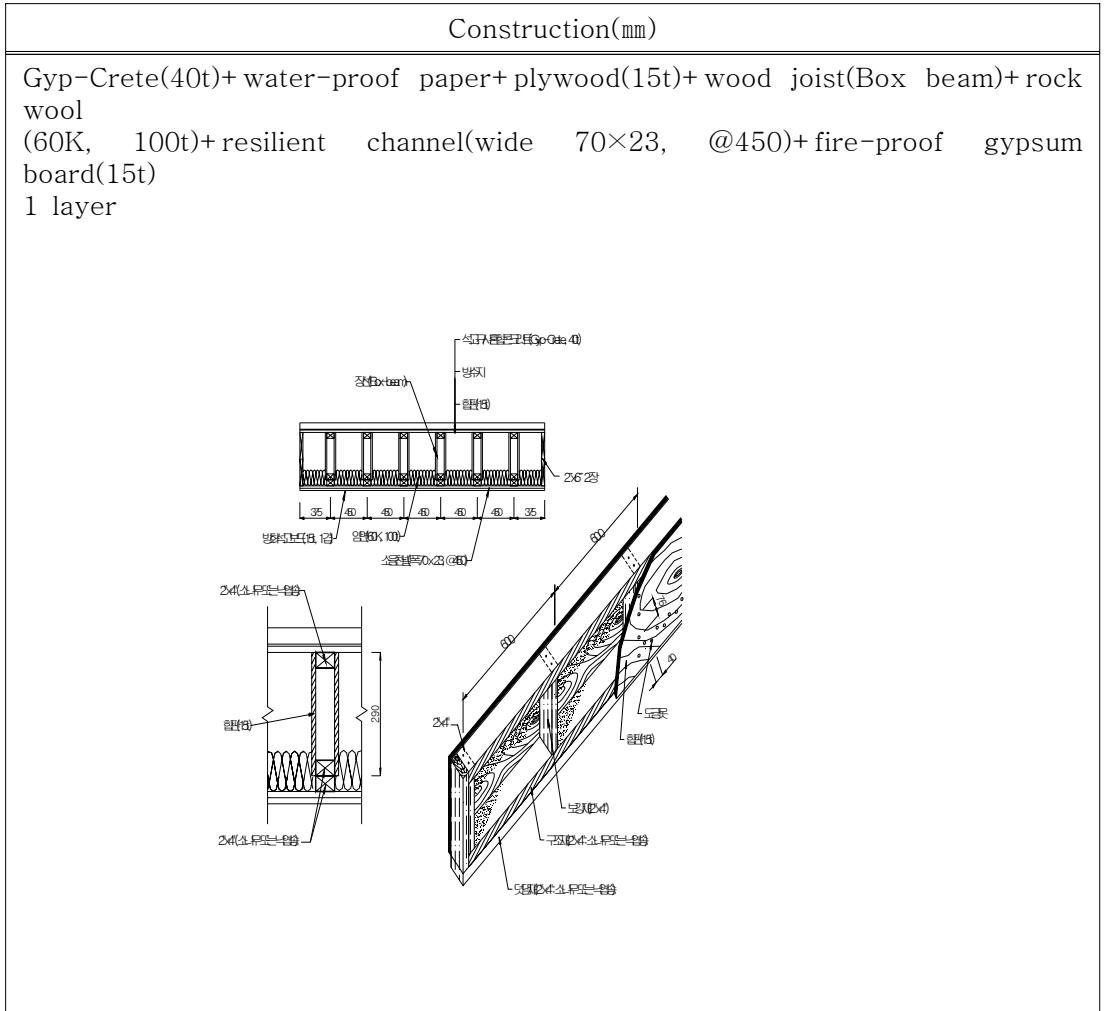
Specification of floor of light-frame wood structure by Korean softwood structural lumber(Box beam joist)
